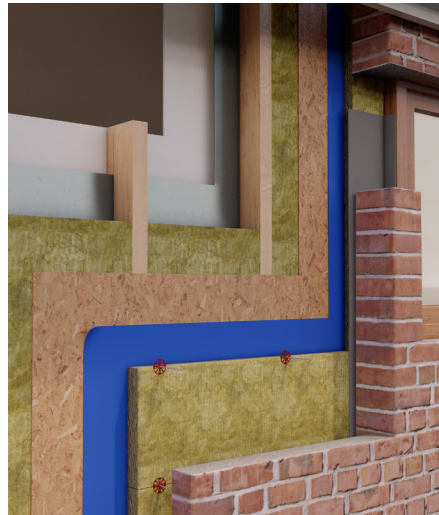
RockClose EN - masonry to timber frame with OSB application
